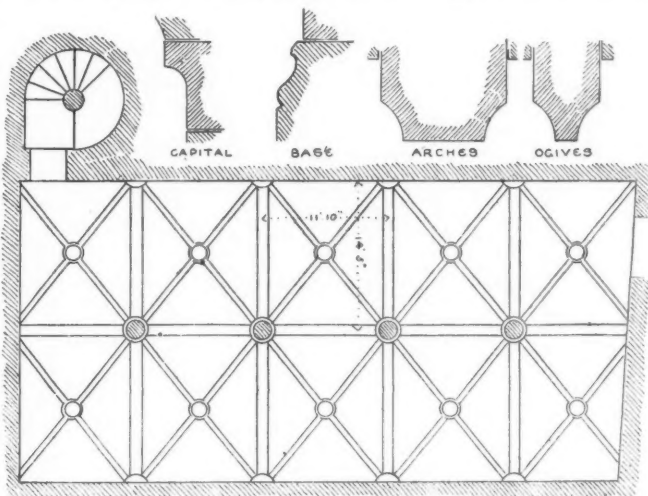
SKETCH PLAN OF THE CRYPT.
